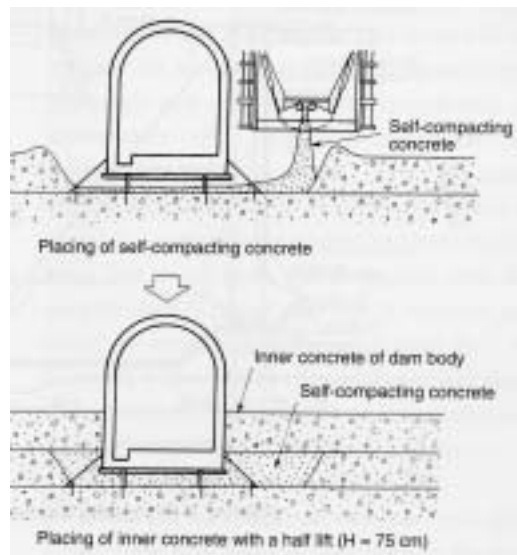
Steps of Placing Concrete Gallery(Unazuki Dam)
